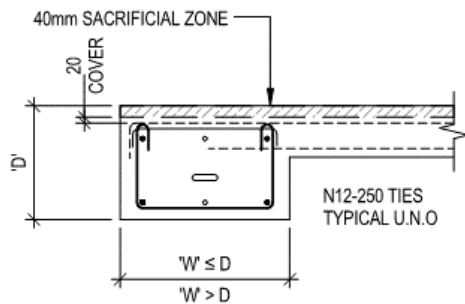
Typical edge beam detail with sacrificial topping.
